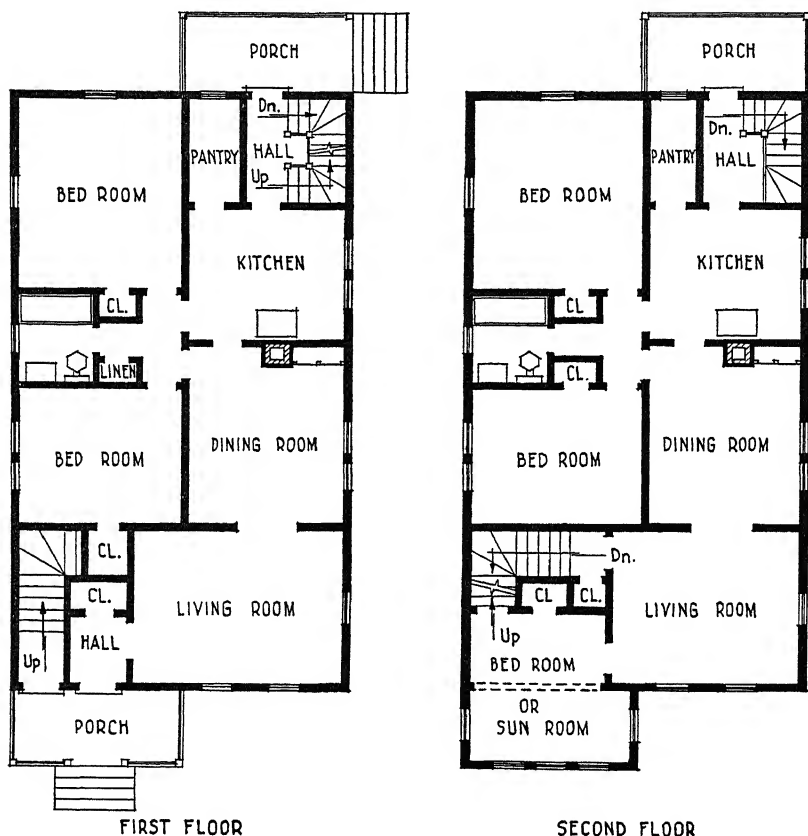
PLAN, TYPICAL TWO-FAMILY HOUSE
